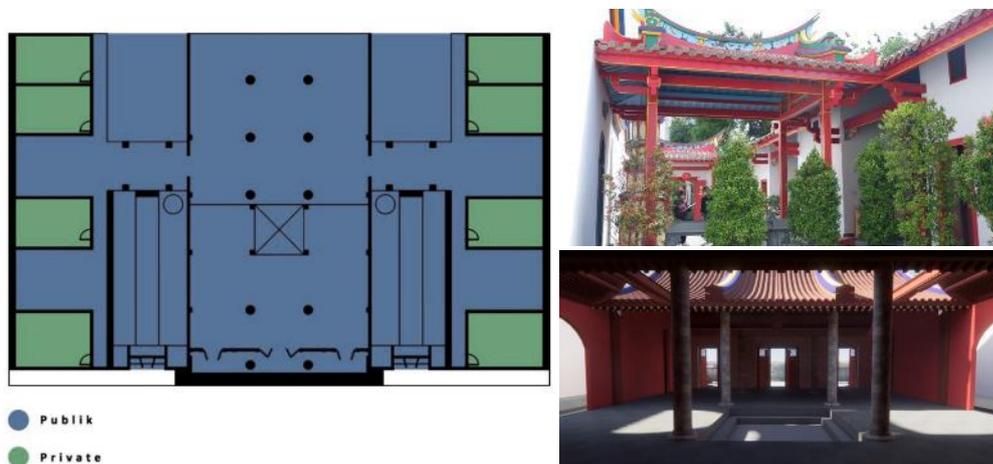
Zoning plan of the temple building and the interior and exterior transitions
